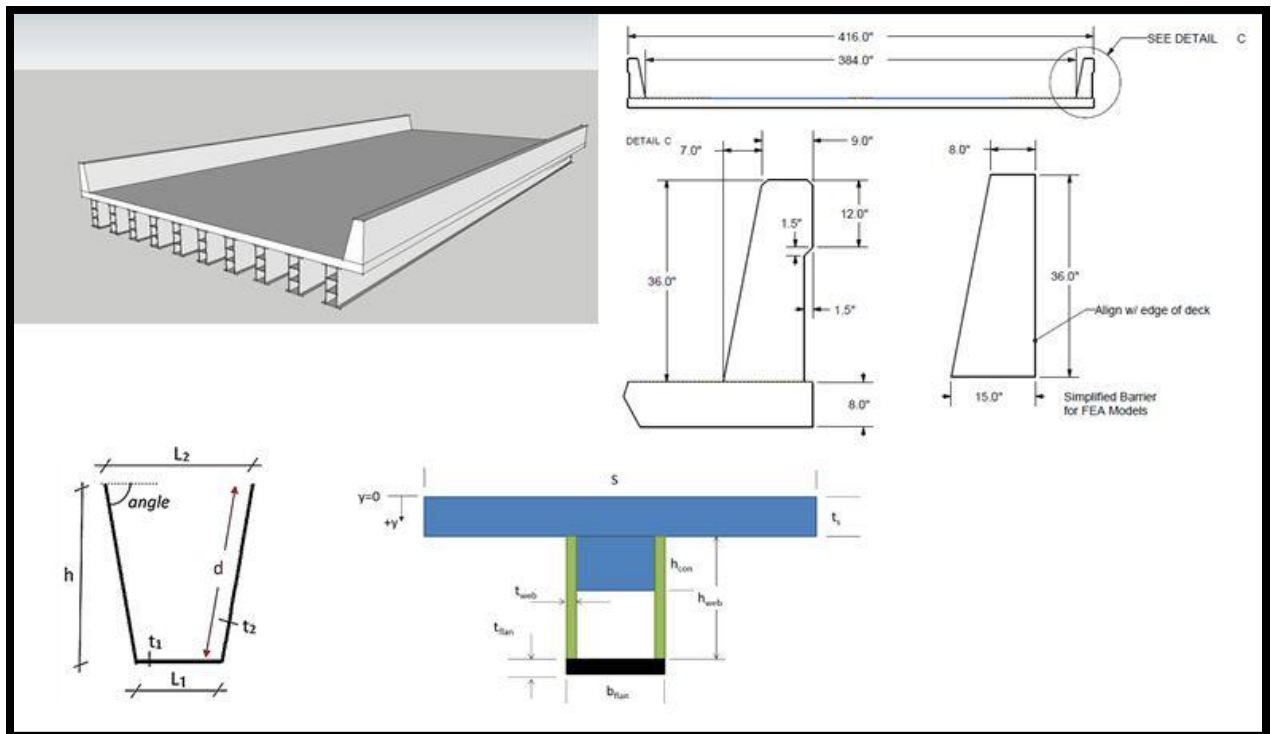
DWB and U-Shaped bridge girder cross-sections
